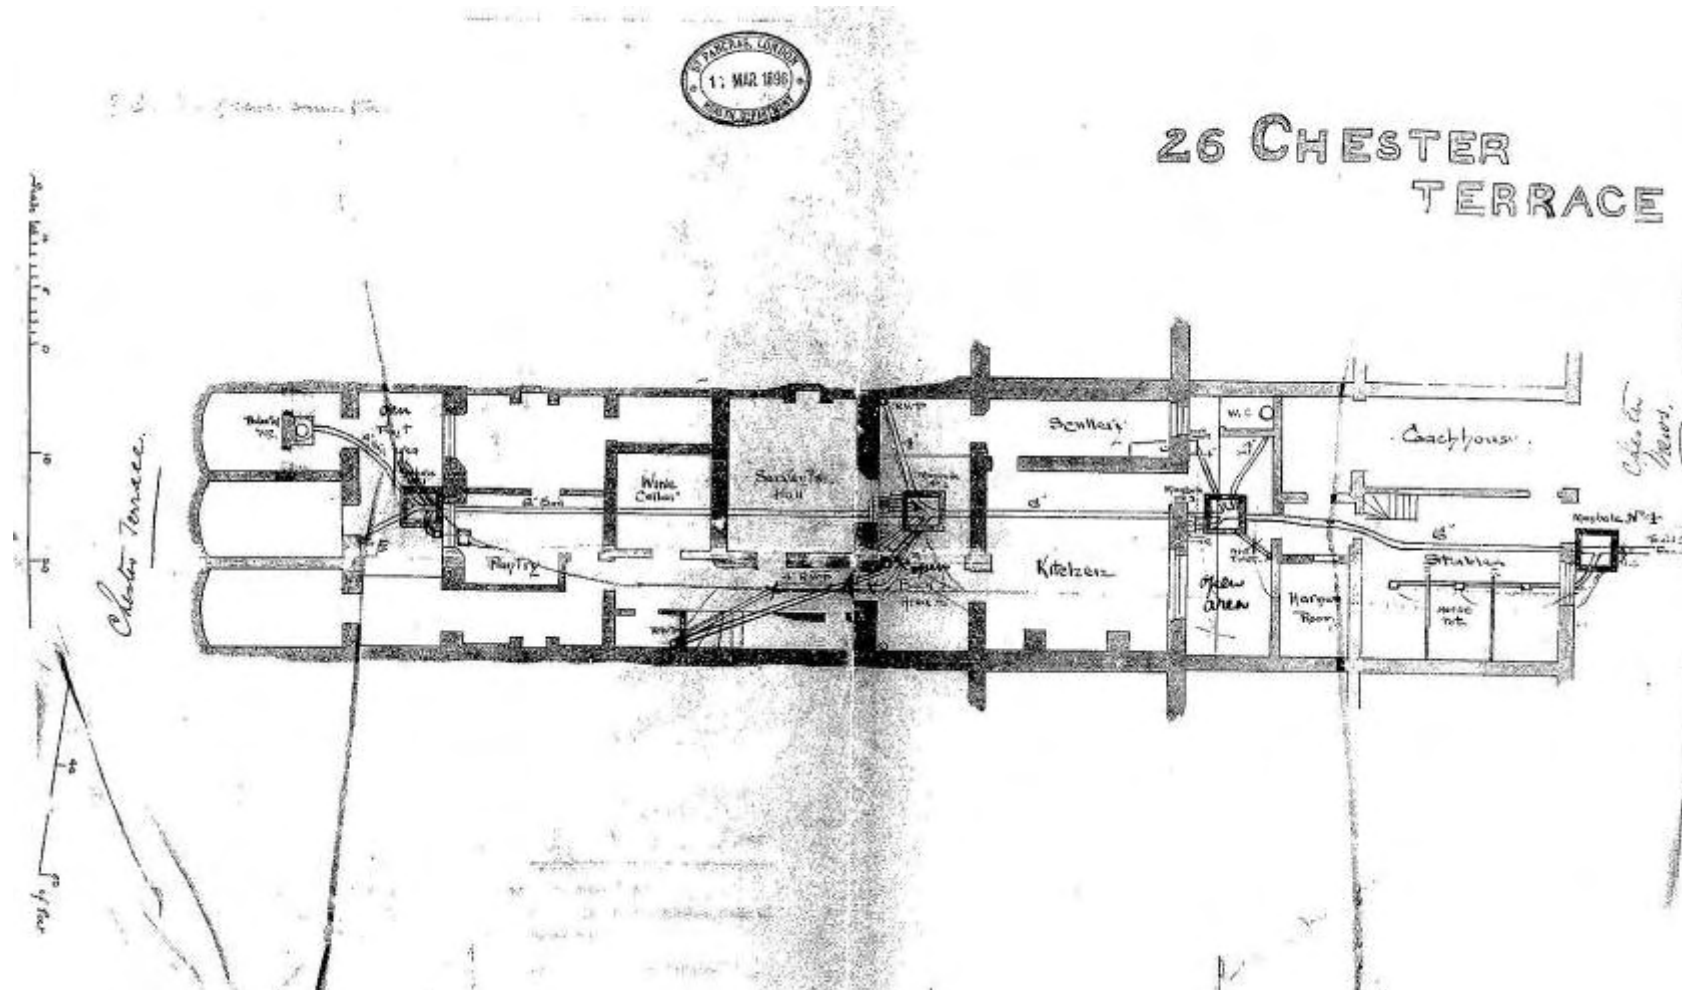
1896 Drainage plan by T.M.England & Co. Ltd.
